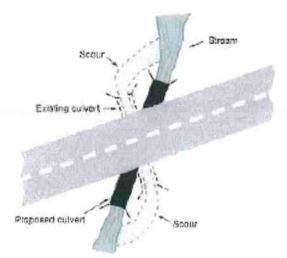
Culvert alignment should be in relation to the stream and not the road. It is important that the stream enters and leaves the culvert in a relatively straight horizontal alignment so streamflow does not have to turn to enter the inlet or discharge into a bank as it exits. This figure shows a redesigned culvert installation that replaces the bending alignment that previously existed. Channel turns at the inlet increase plugging potential because wood going through the turn will not align with the inlet. Similarly, channel turns at the inlet and outlet are often accompanied by scour against the channel banks (Wisconsin Transportation Information Center, 2004).
